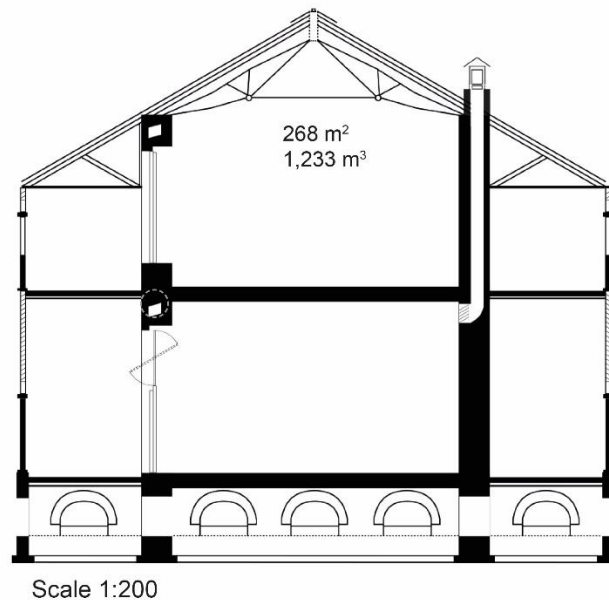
Section of the prototype ward in British India Stations. The section was adapted from the plan XXV²⁹. Source: Author.
